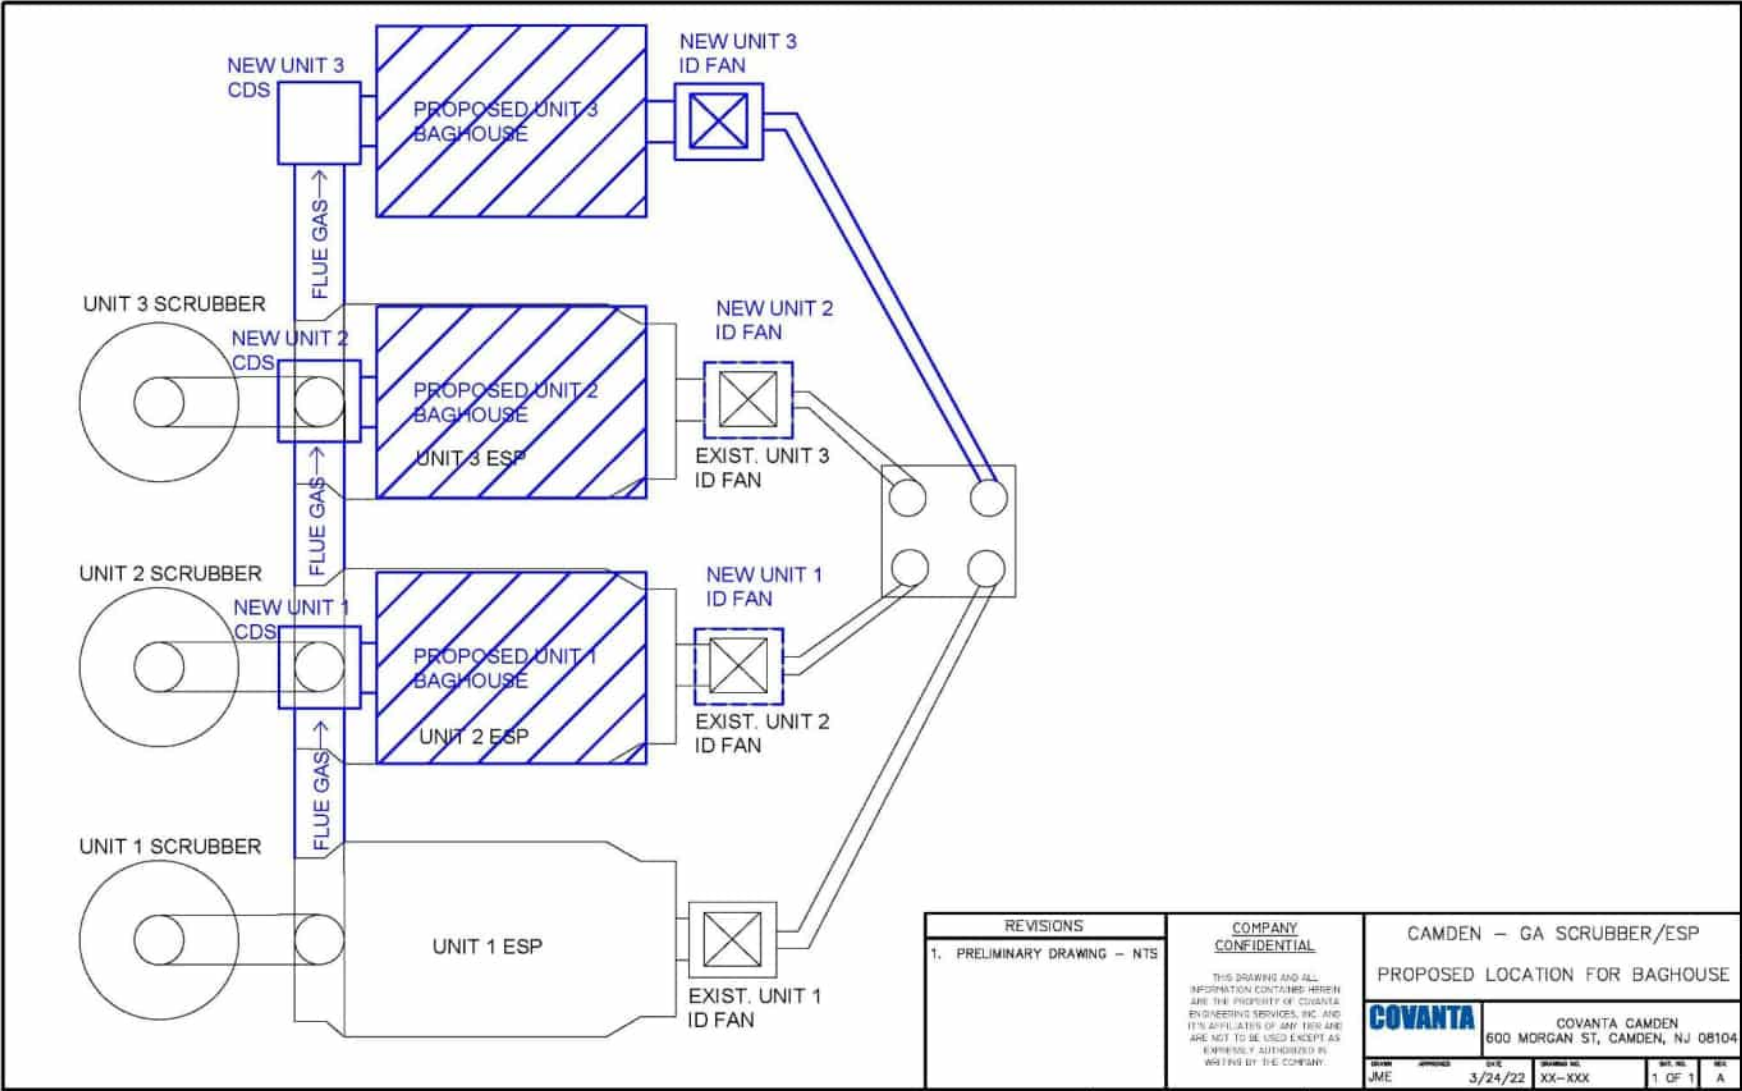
Covanta Camden AQCS Baghouse General Arrangement
